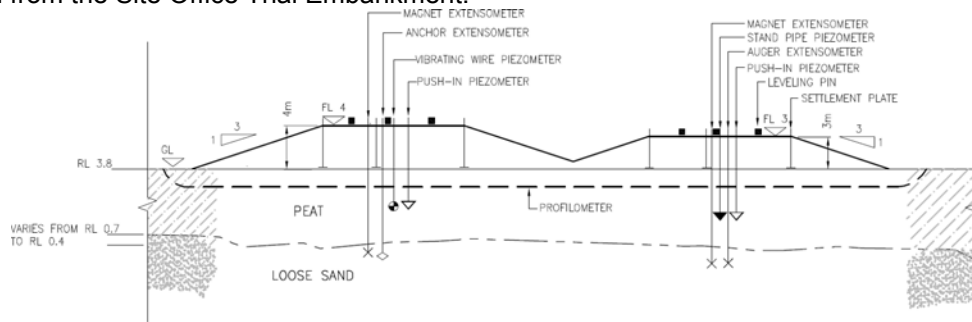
Site Office Trial Embankment Instrumentation Cross Section
